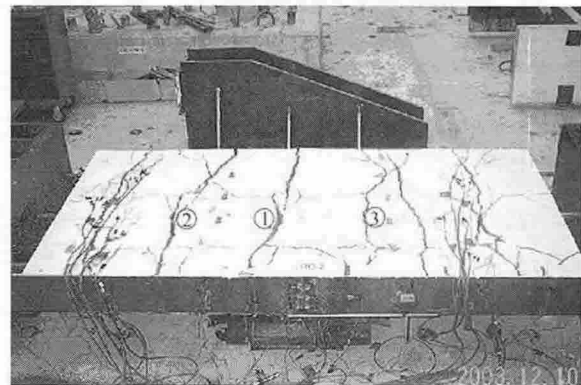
Crack patterns in a lined wall element under uniaxial tension.
